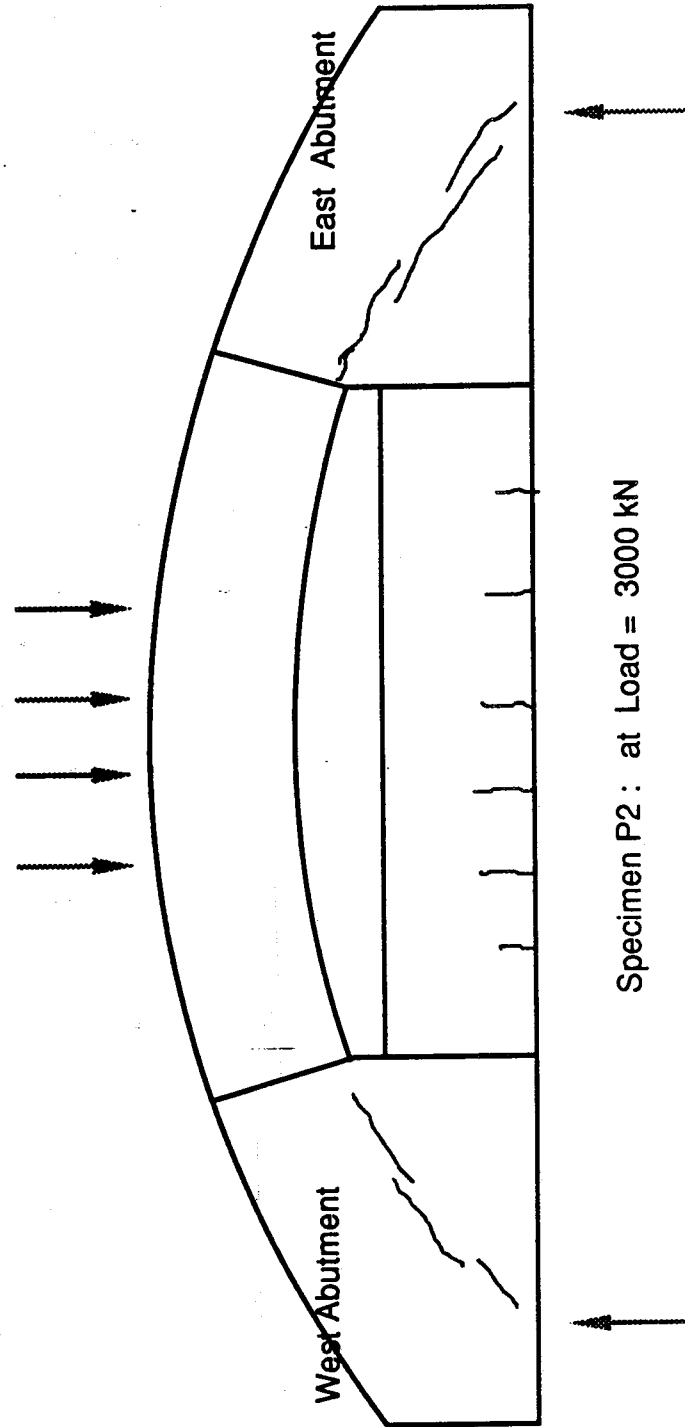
Cracking in Prestressed Tie in Specimen P2
